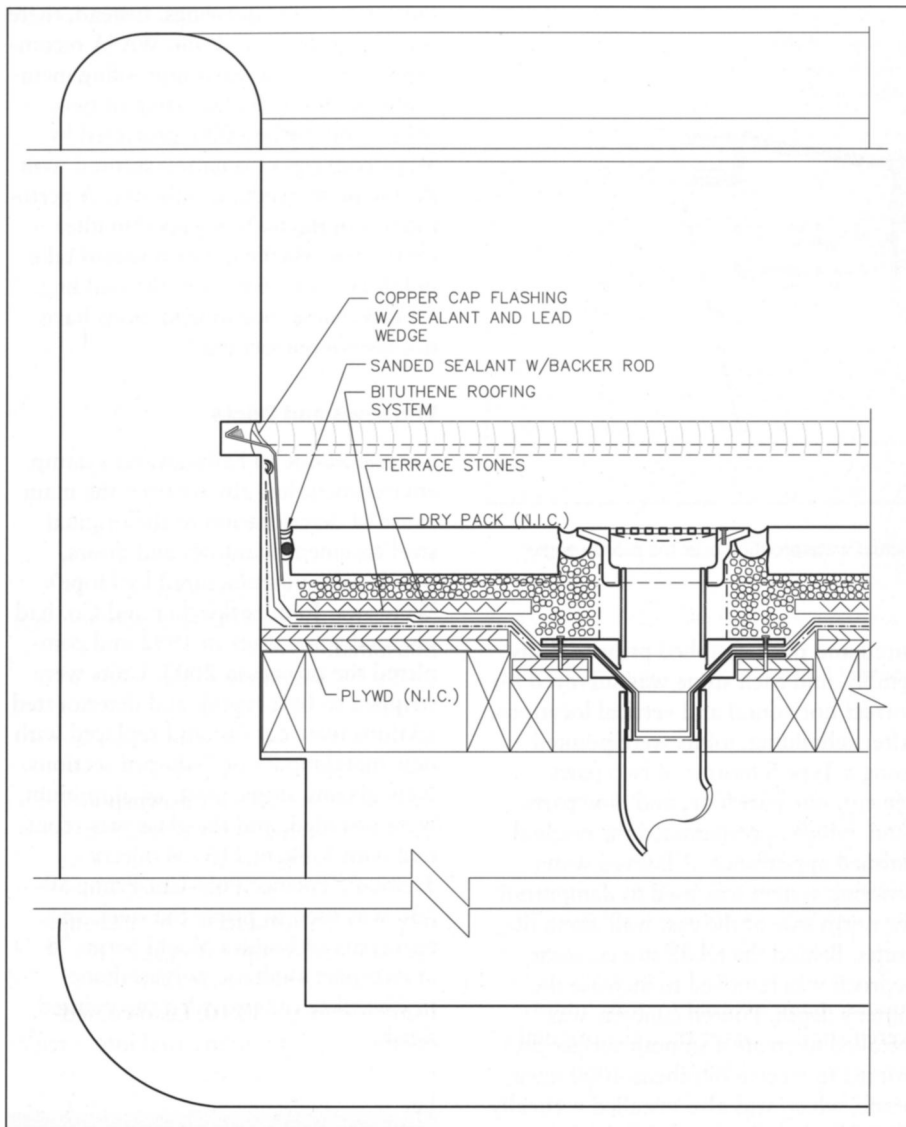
Detail of a bilevel sumped drain installed on the terraces. These drains replaced the original copper tubes, which could not be integrated properly with the waterproofing and did not permit subsurface drainage.
